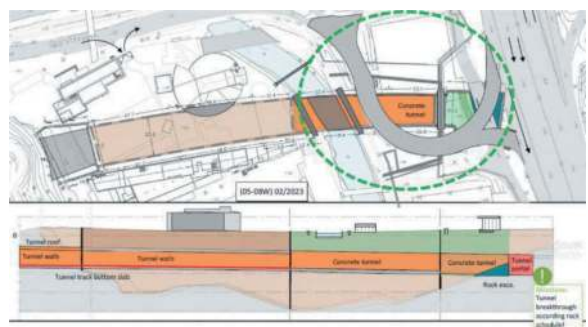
Ramp to E6, Rondo, Restaurant and Mölndalsan River.
